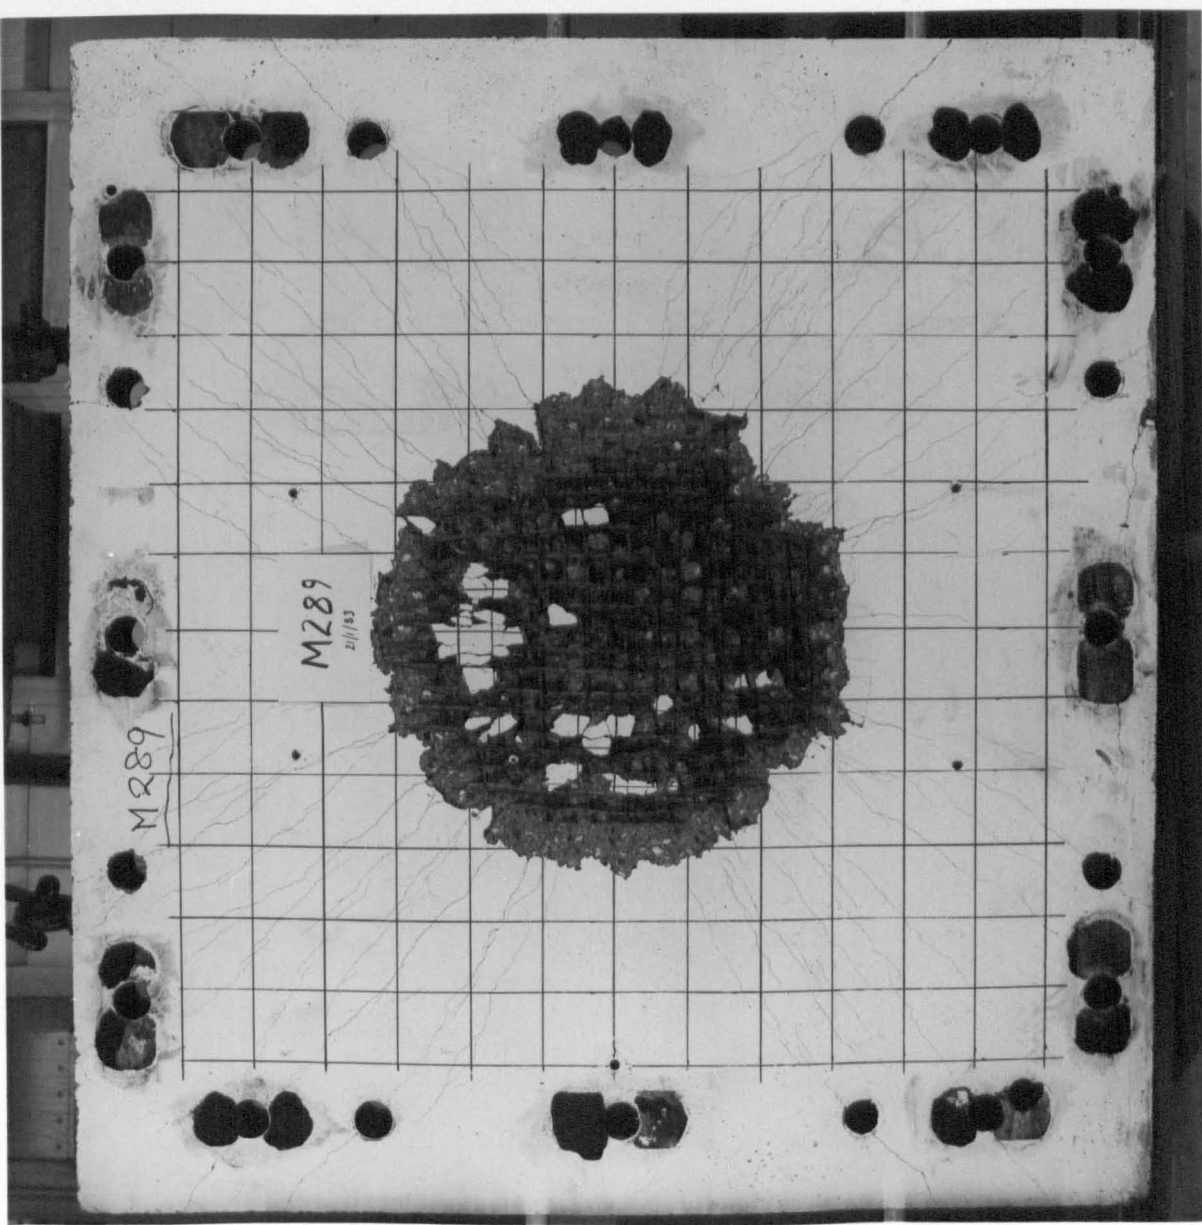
BOTTOM FACE OF TARGET B26 AFTER IMPACT TEST
